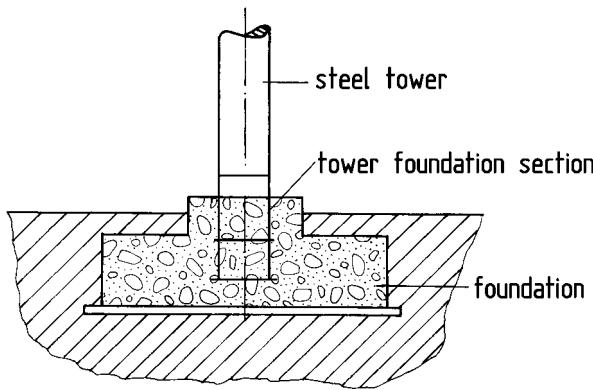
Standard foundation (slab foundation) for steel tubular towers
